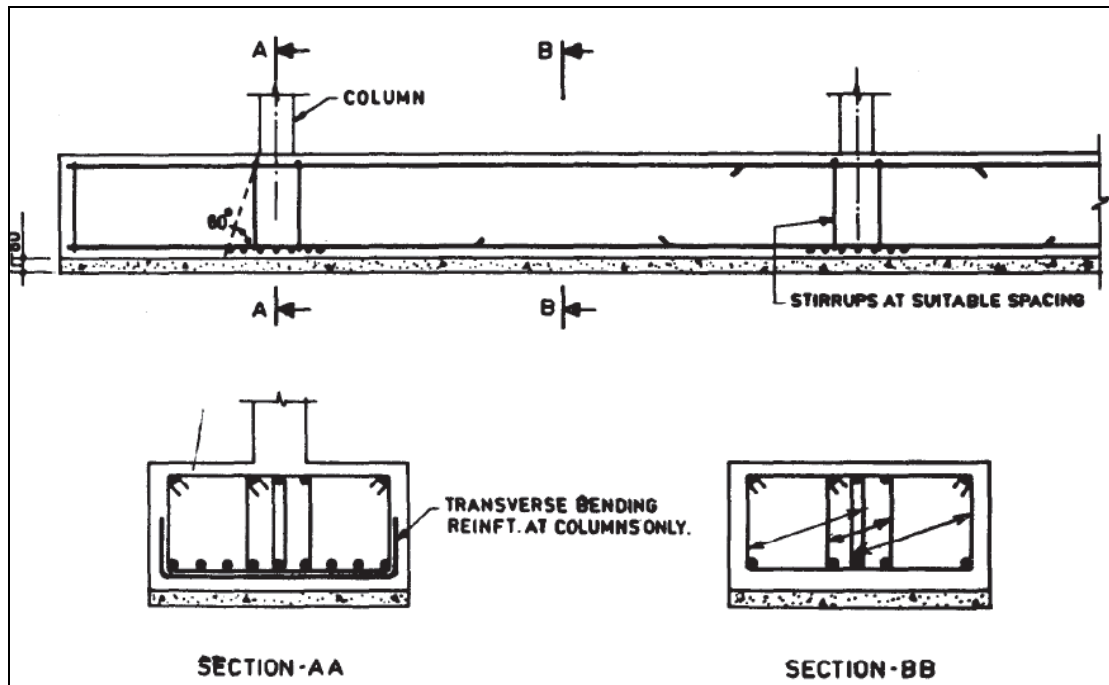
Typical detailing of a strip footing as described in SP 34
